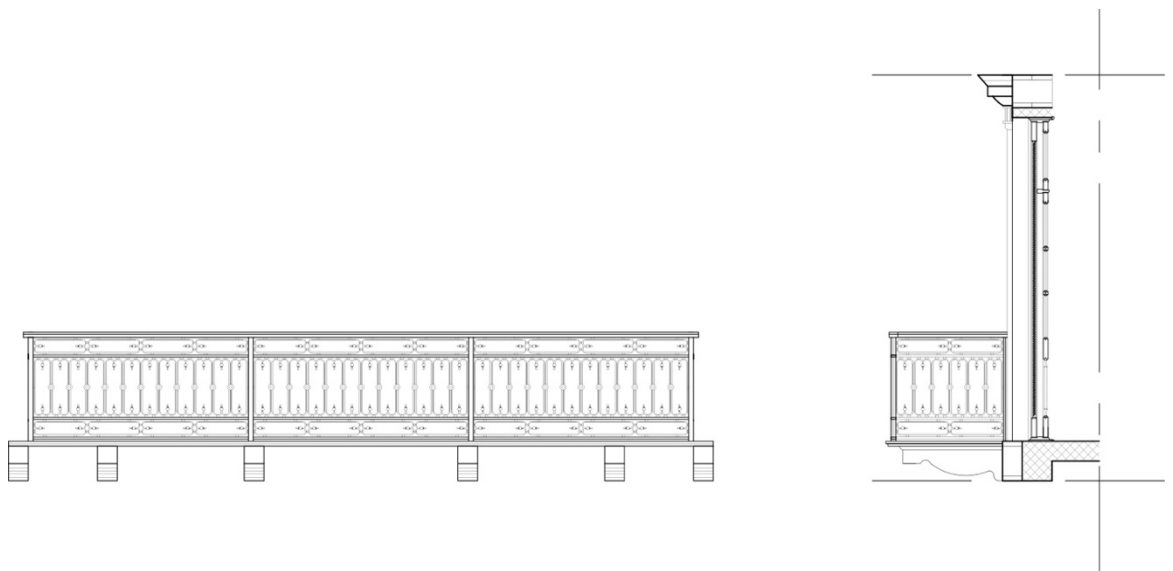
balcony's metal steel work handrail, source: the researcher
